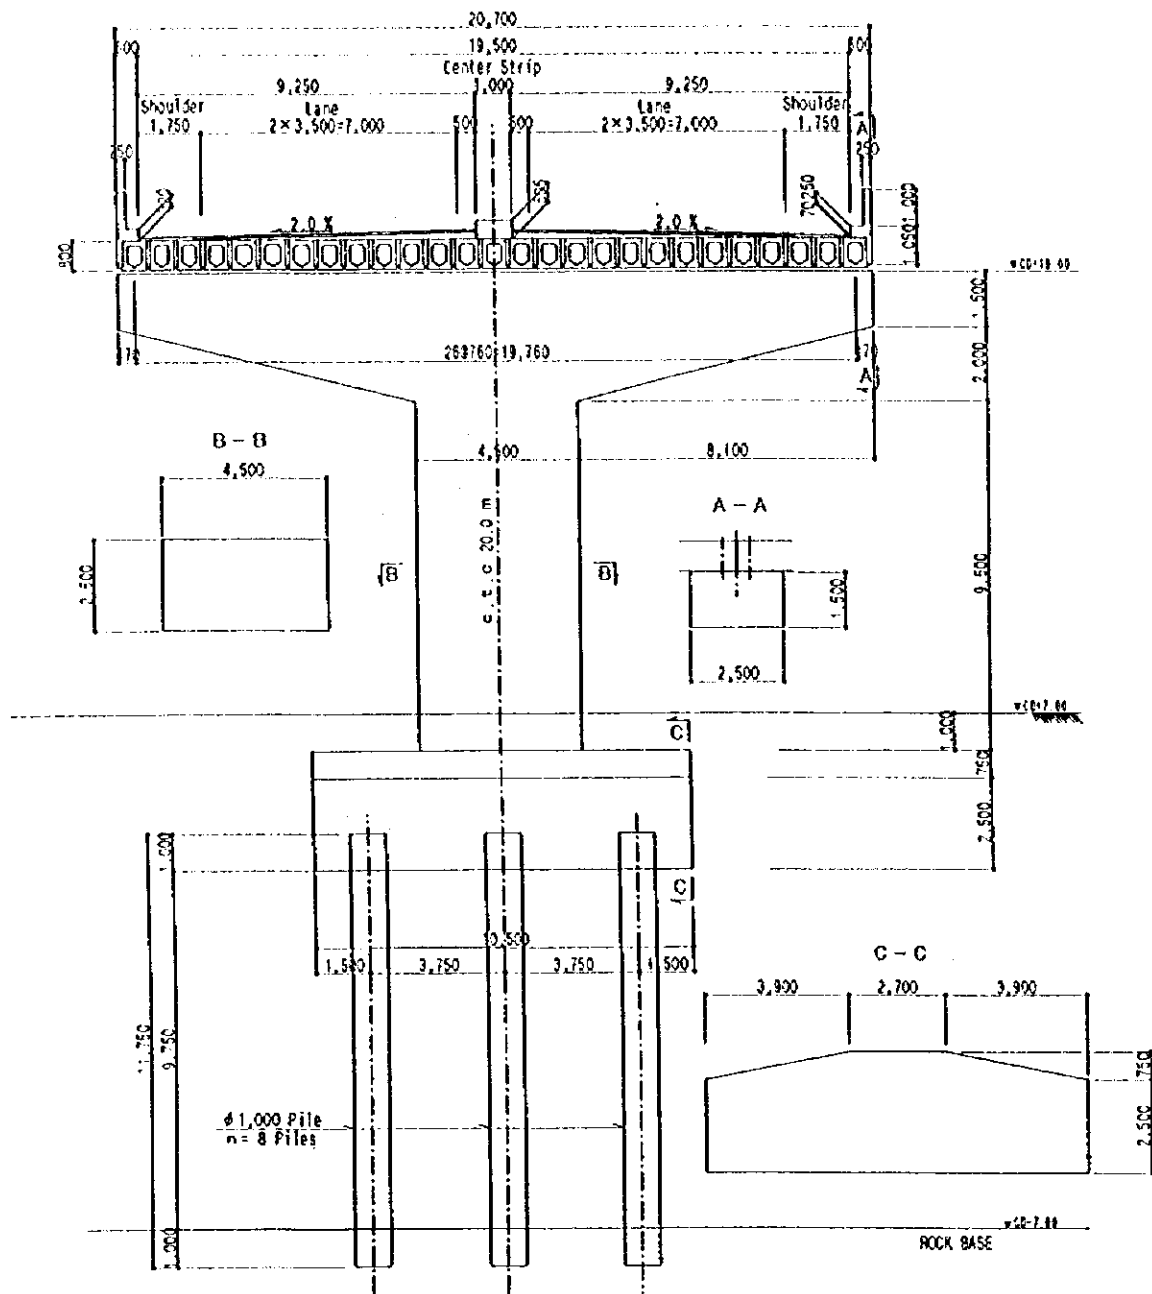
Cross Section of Elevated Container Road in Port Premises
